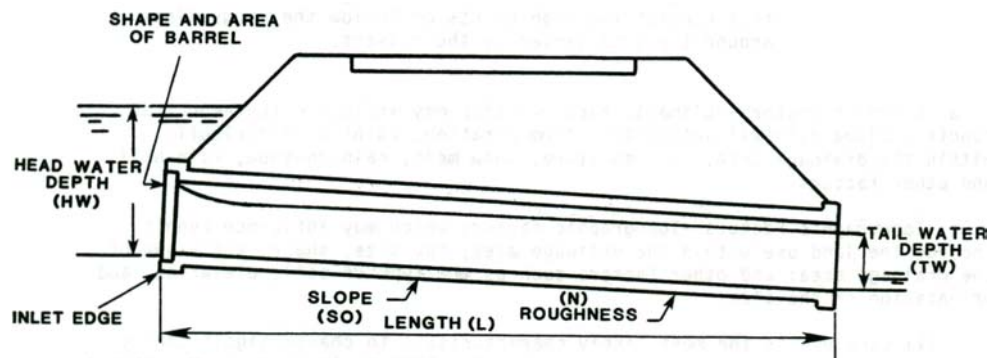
Factors Affecting Culvert Discharge (Source: Adapted from Concrete Pipe Handbook, American Concrete Pipe Association)
